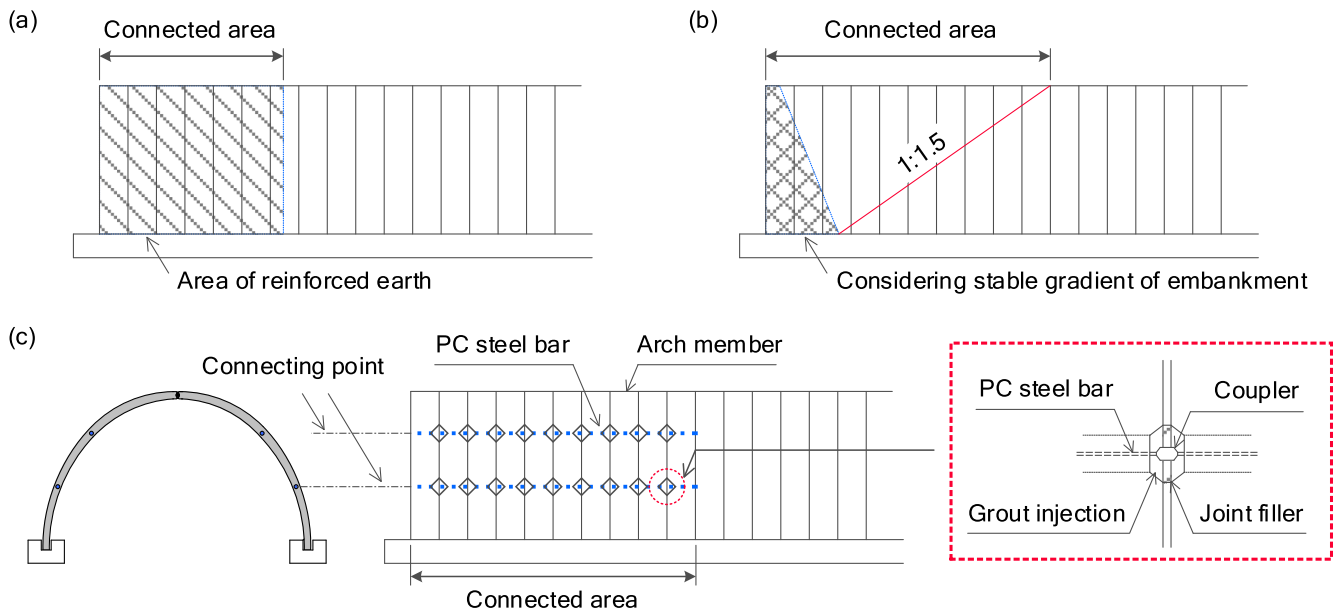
The longitudinal connection of the arch members depends on the type of hinged arch culvert. In the old type of three-hinged arch culvert, the arch members are (a) connected with the construction of a reinforced earth wall or (b) connected without the construction of a reinforced earth wall, and (c) connected longitudinally by PC steel bars (modified after Technical Committee of Manual for the Design and Construction of Techspan Construction Method in Japan, 1998).
